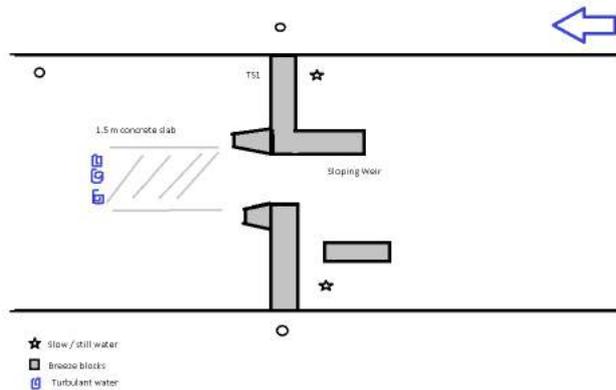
Site plan of Mill Stream Barrier 3
